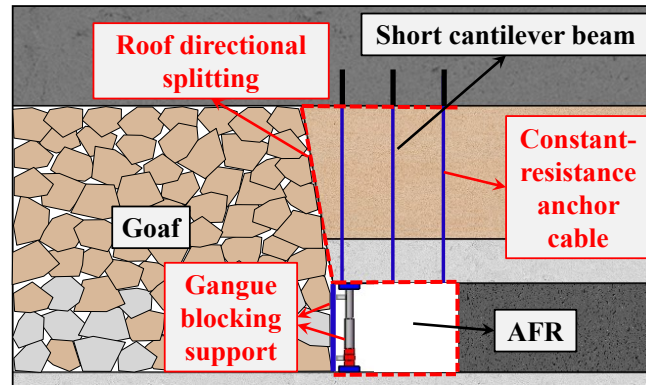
The model of the “short cantilever beam” for coal mining (He, 2009)
